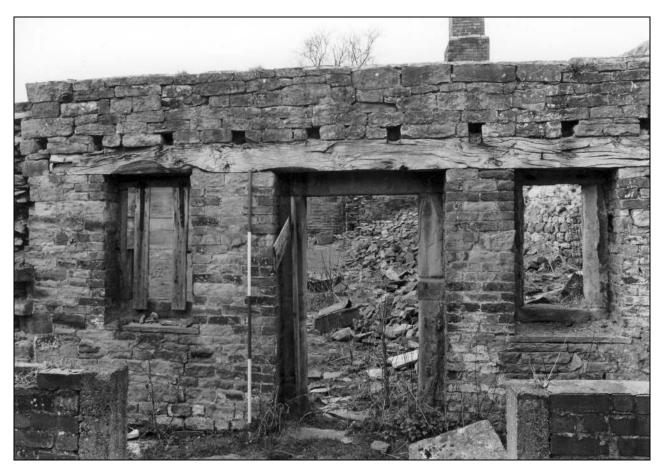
Interior of building 2a, from the east (film 2, frame 14)
